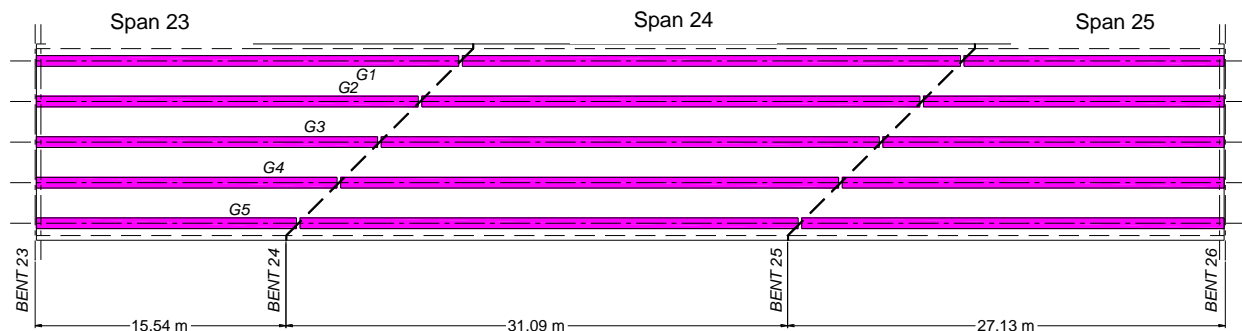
Span and girder layout for monitored segment of Bridge #2 showing anti-symmetry
